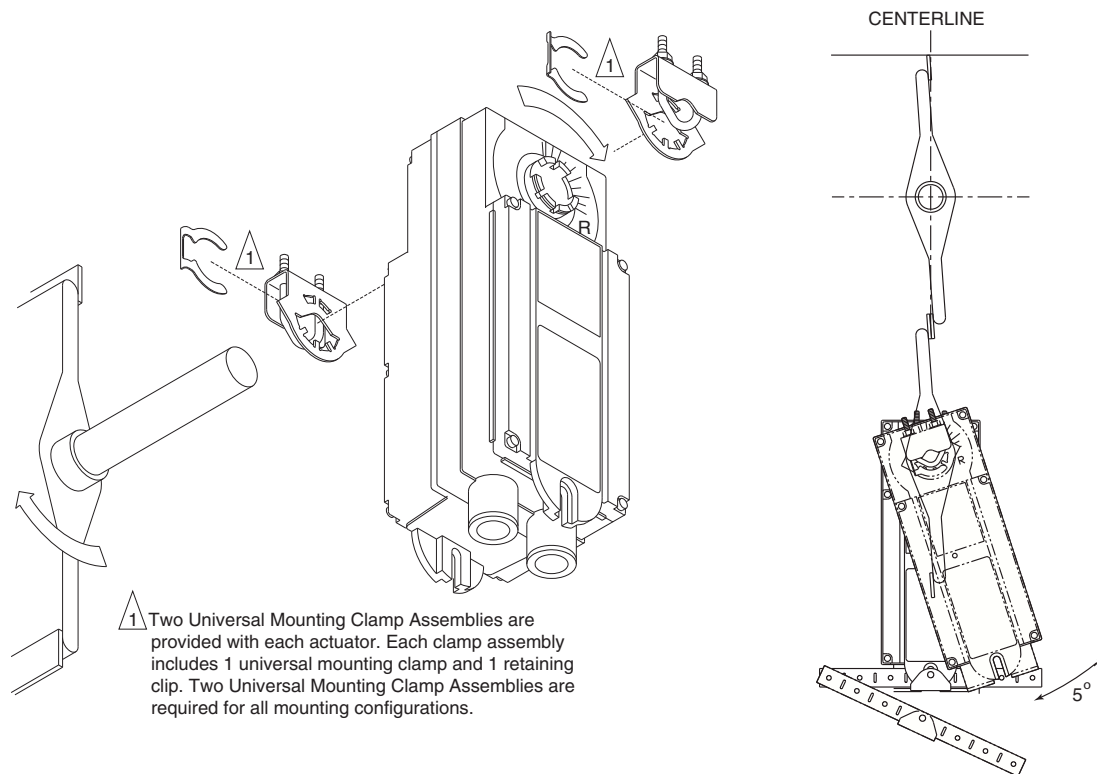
Long Damper Shaft Mounting with Clockwise Spring Return for Normally Closed Damper.
